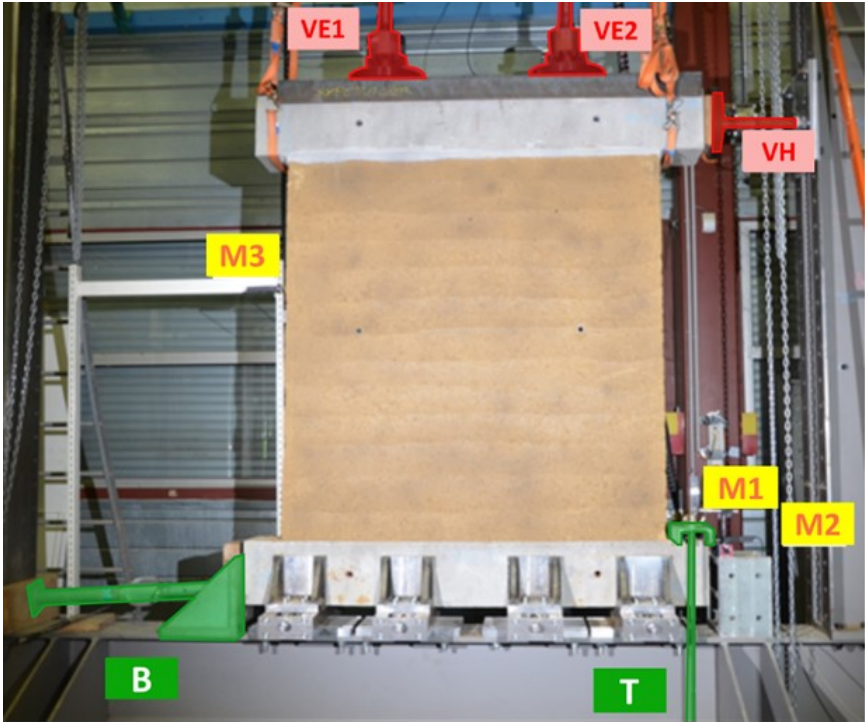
Test setup on a rammed earth wall (1.5 m × 1.5 m × 0.25 m)
